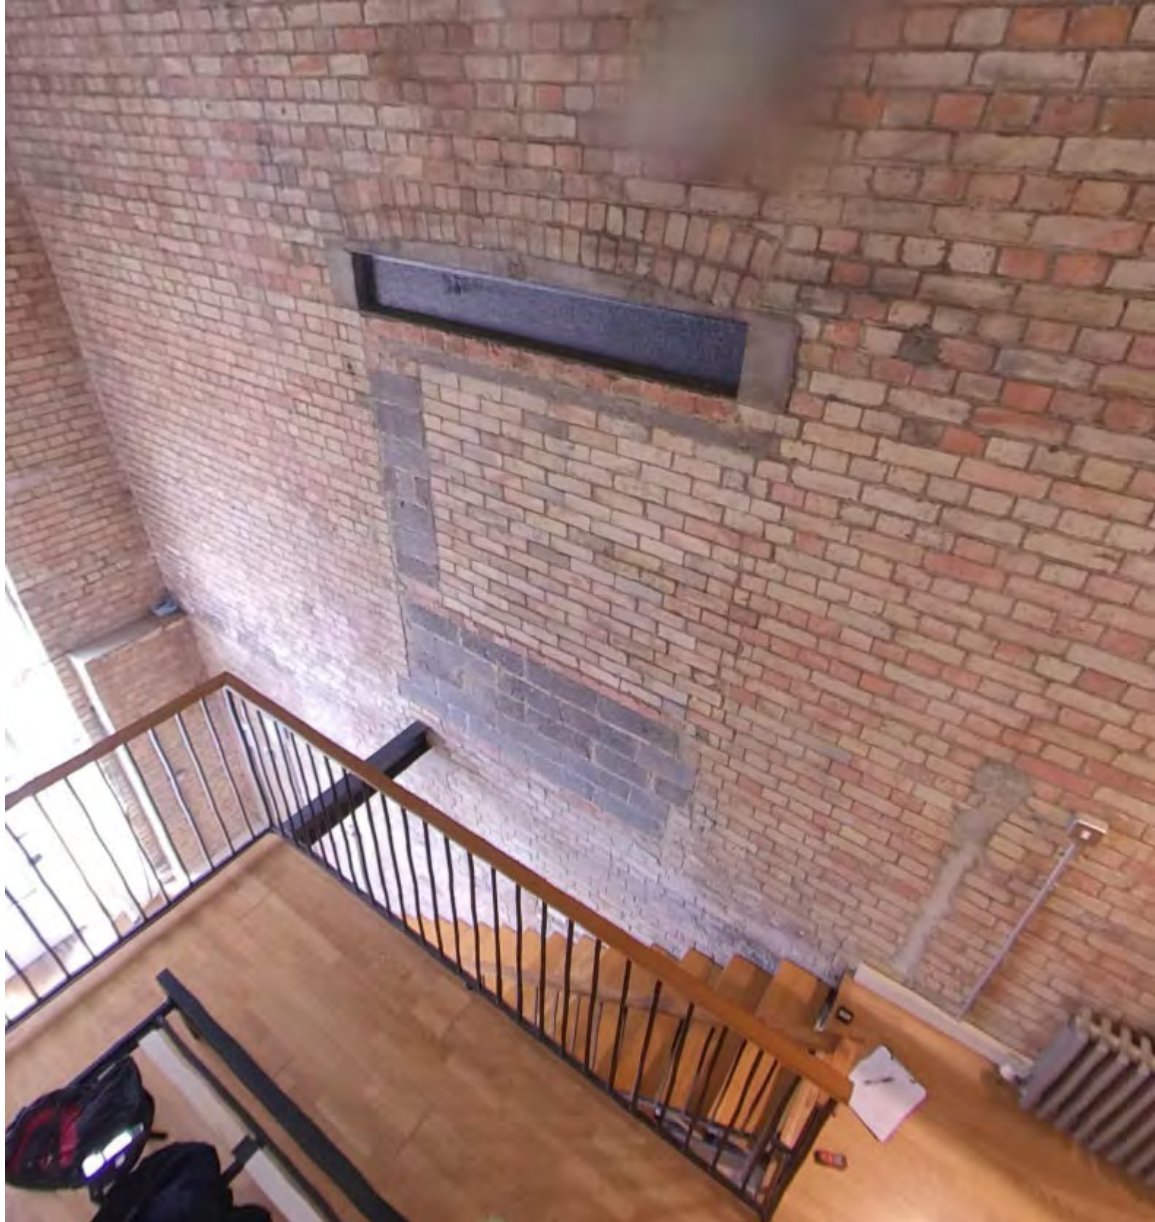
corner of the building with a brick pillar and marks on the wall which seems suggesting the presence of a mezzanine level.
